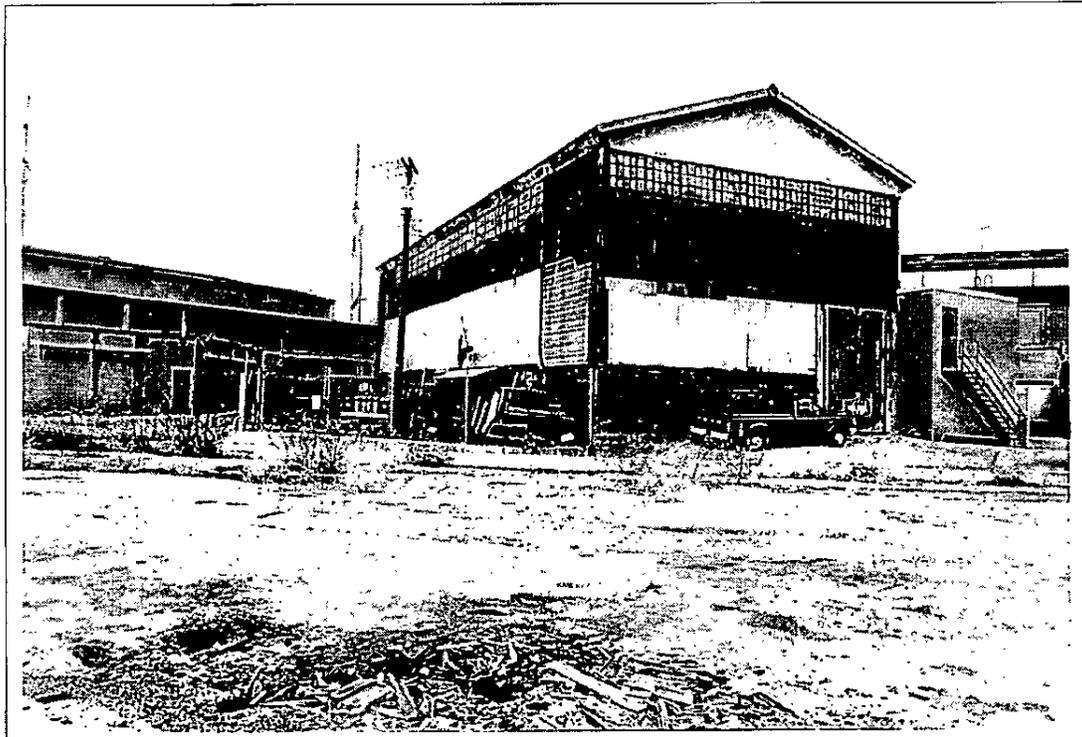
Harlan & Hollingsworth West Mill (N-12454), south and east elevations
